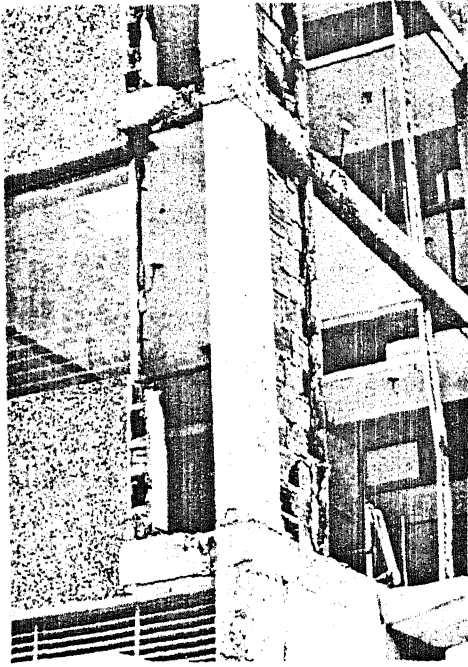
Shear Cracks in Beams, Coral Building
